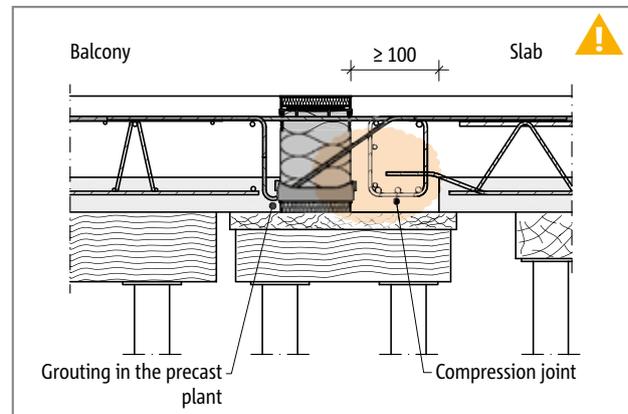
Schöck Isokorb® XT type K: Indirect support, installation in conjunction with element slabs (here: $h \leq 180$ mm), compression joint on floor side
